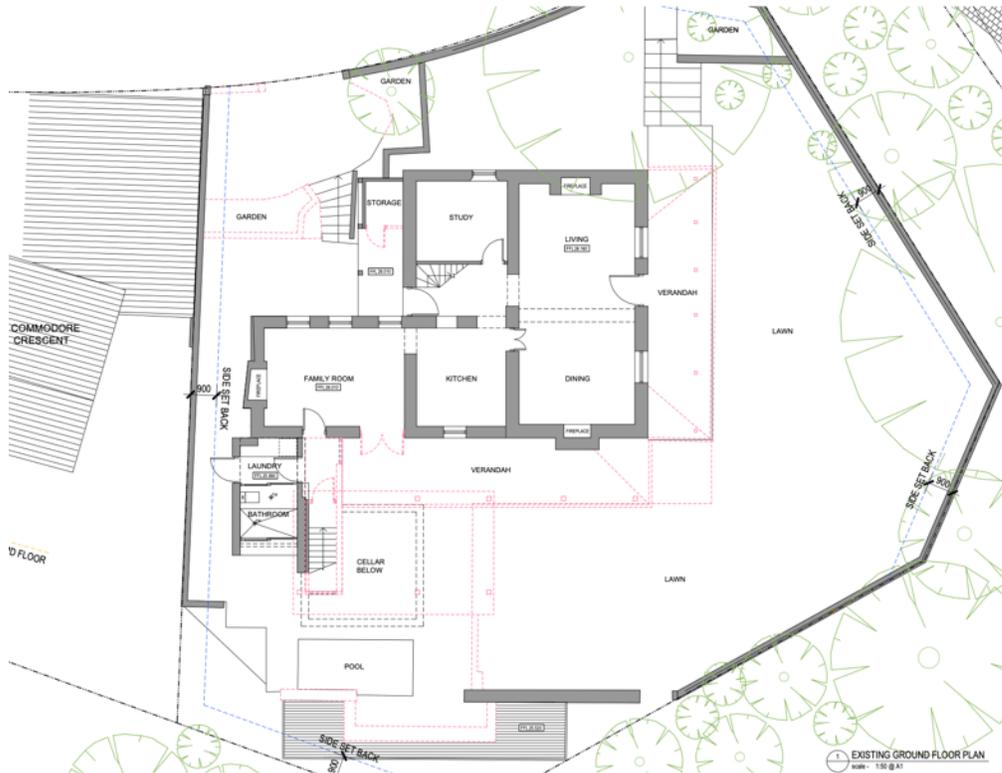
, Existing Ground Floor Plan, Michael Cumming Architect, 12.08.22
